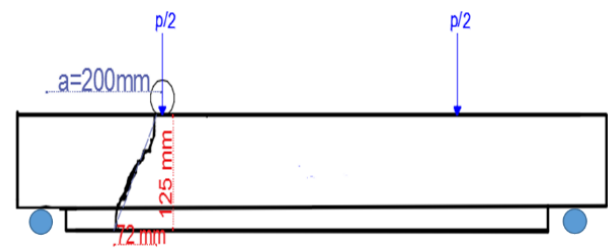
The shear crack pattern of WS-L1-steel-Shear
